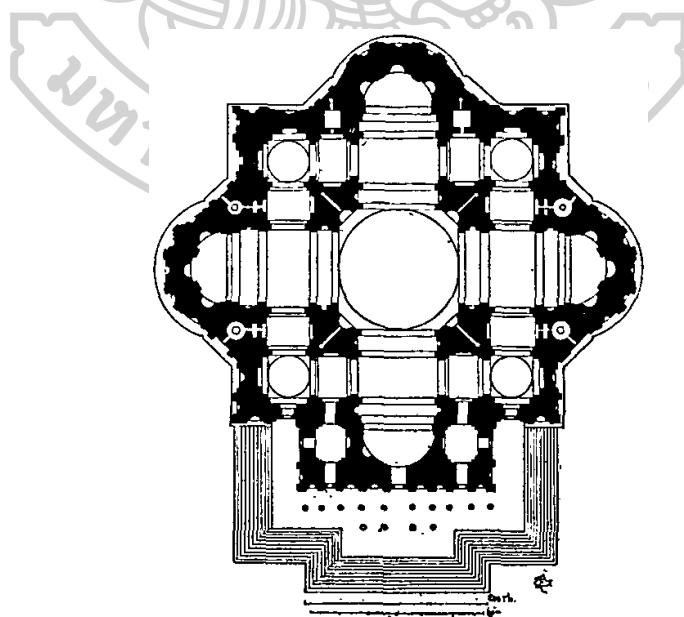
Plan St. Peter's 1546-1564 A.D. (Aristoi, 2011)
